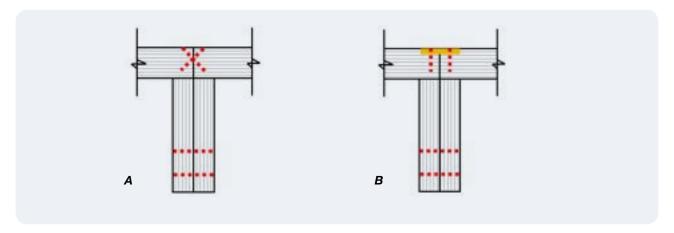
Panel-to-panel connection options for ribbed deck floor.
